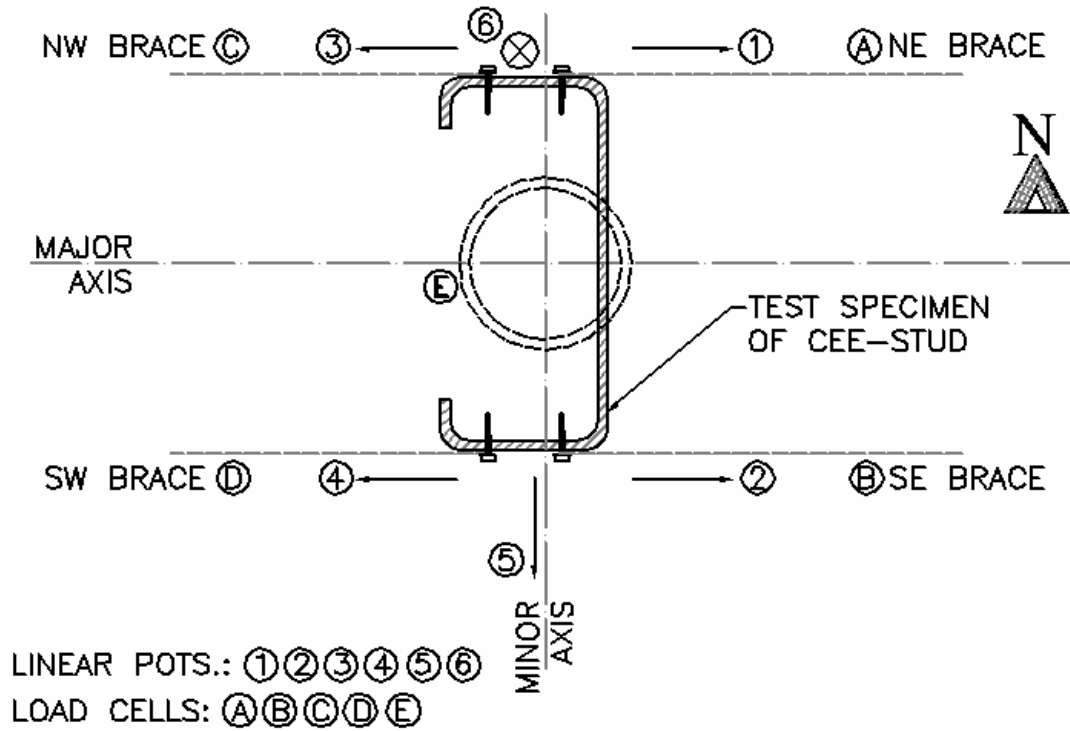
Schematic Mid-height Bracing and Instrumentation Locations on Test Specimens
